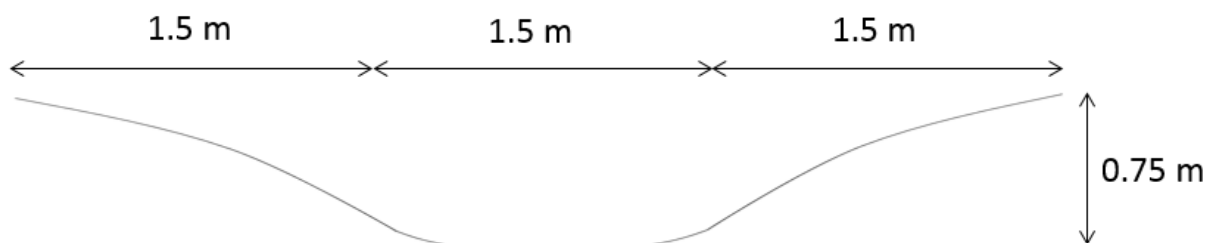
Long Section of a Tiered Scrape System (NTS)
